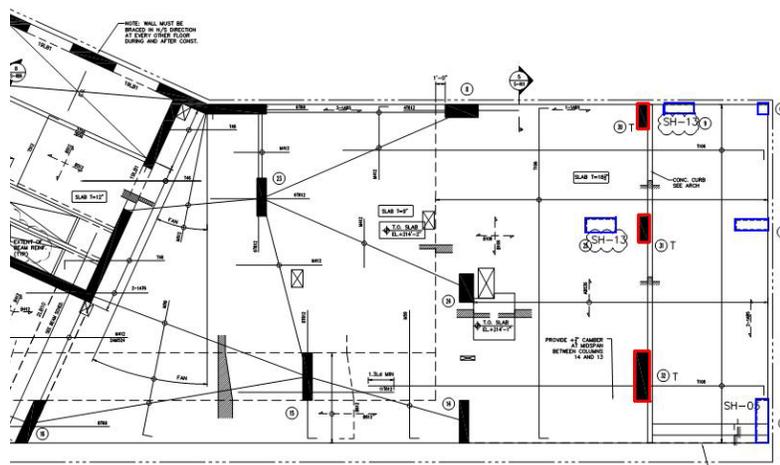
19th floor transfer slab with red denoting terminated columns from above and blue denoting new column locations on the 18th level below
